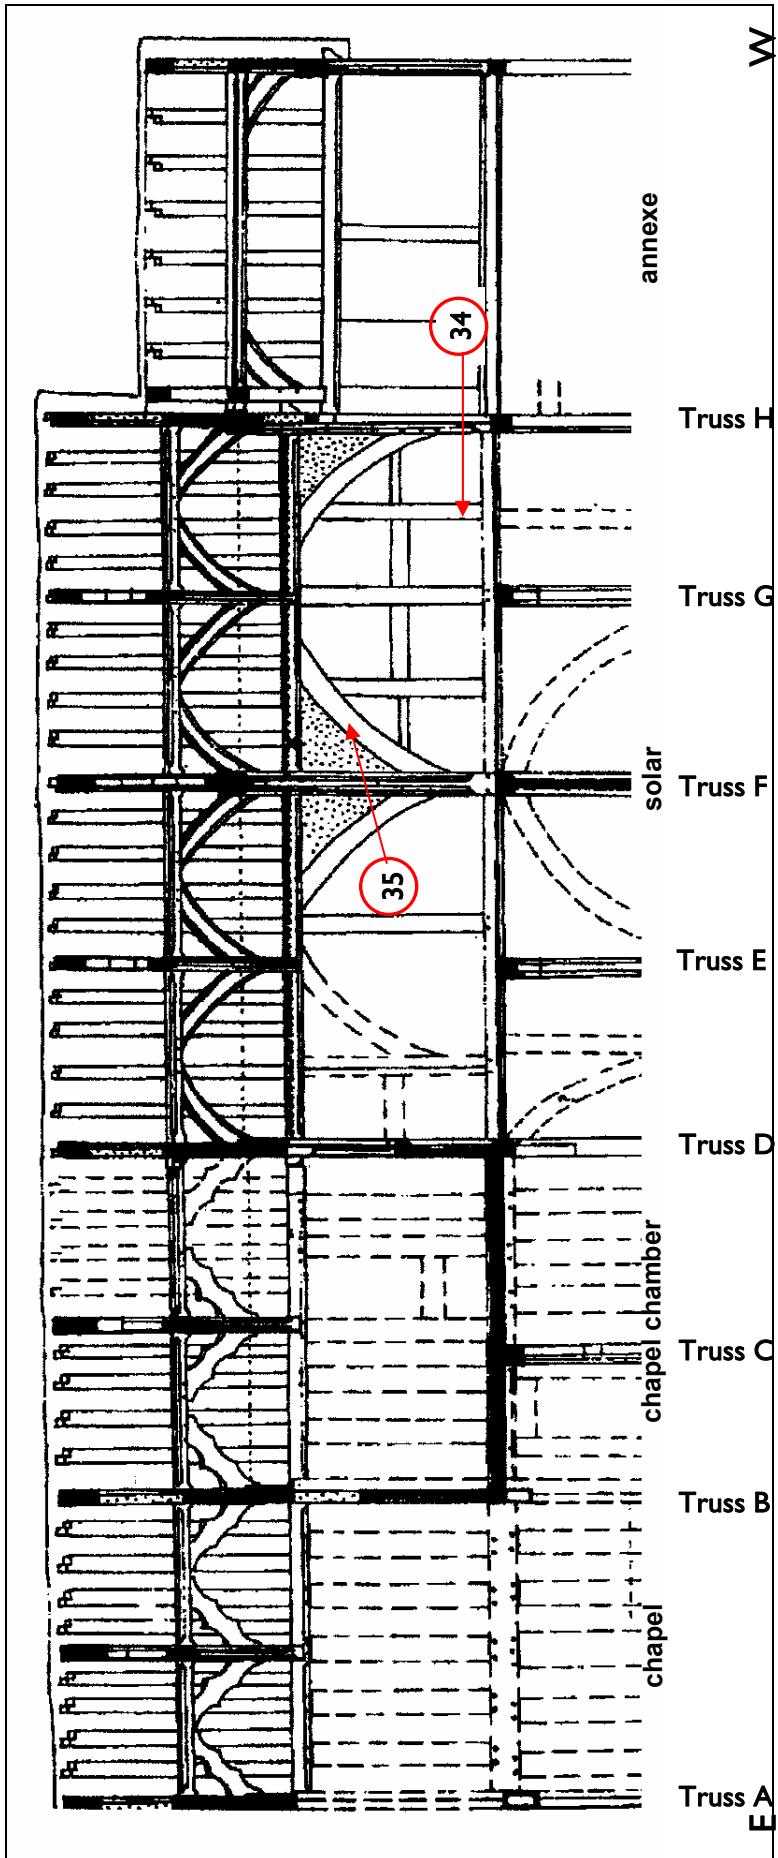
Long section through the north cross-wing (chapel, chapel chamber, solar, and west annexe) to show position of trusses and timbers sampled (after Jones 1975–76)
